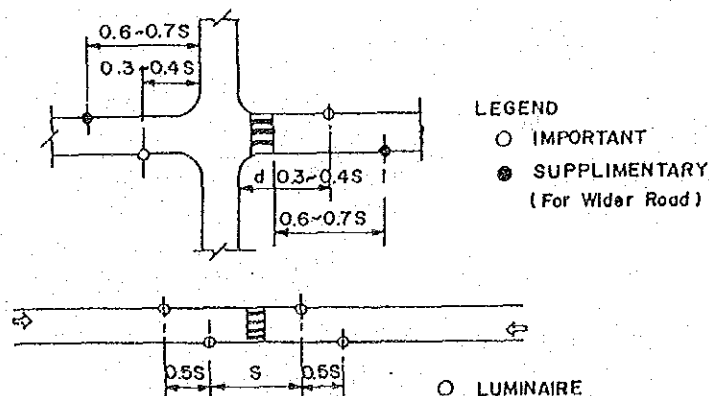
Typical Luminaire Arrangement (Crosswalk)
